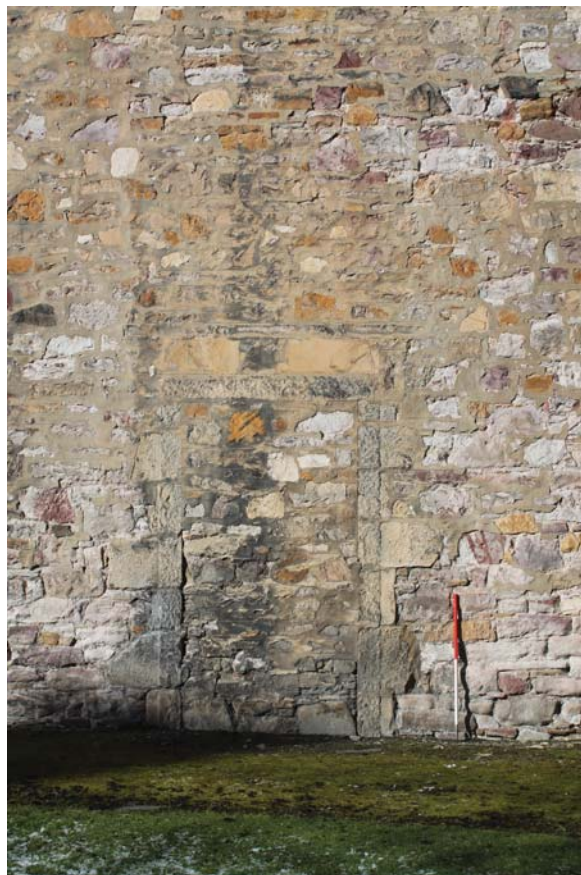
South-east elevation, detail of the blocked opening to the south-west side from the south-east
